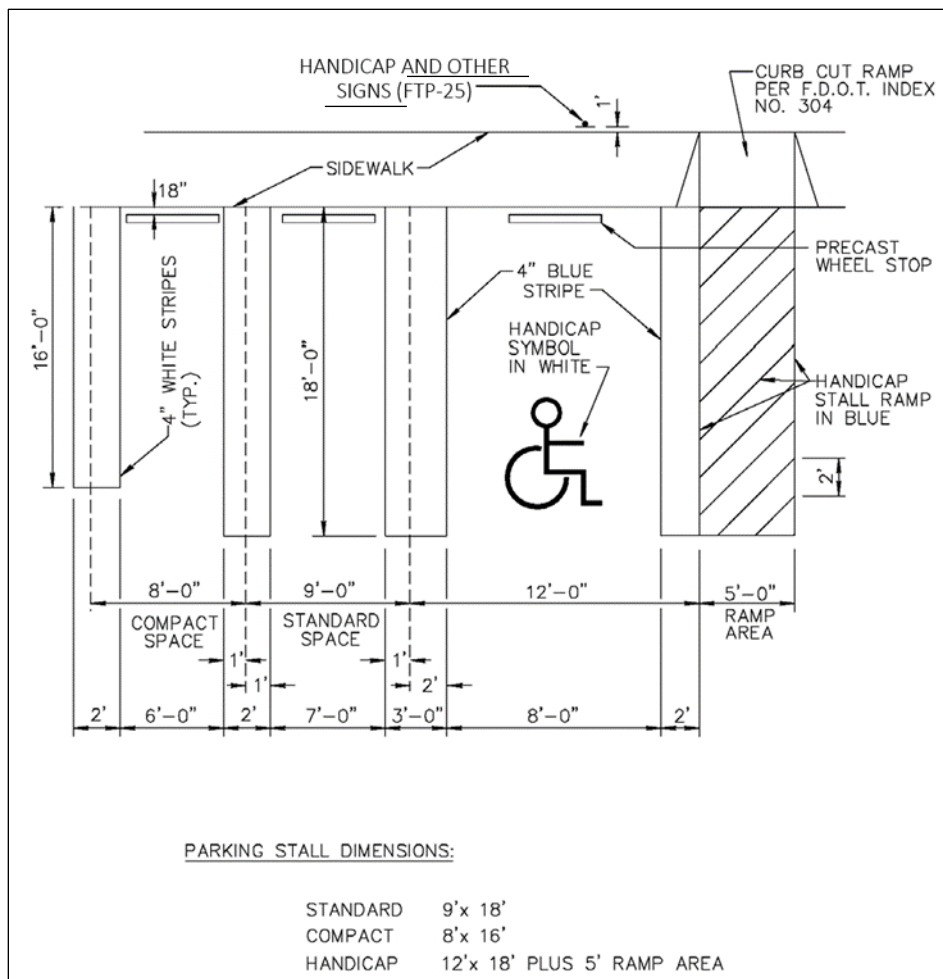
(D)(6)-1, Typical Parking Space Detail RT 4.2
